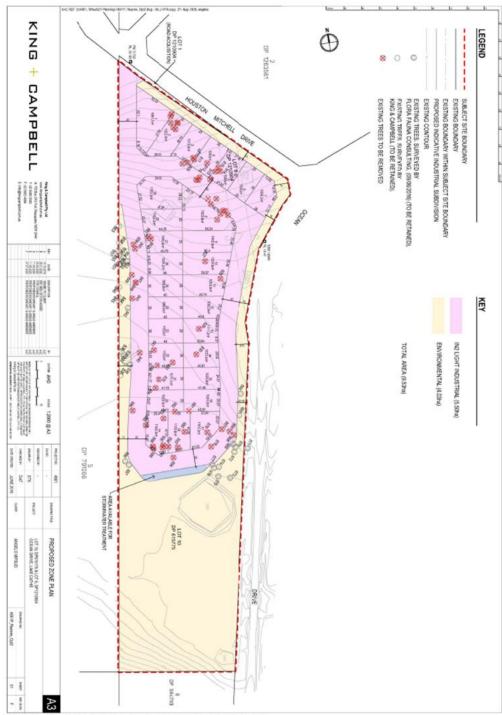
Proposed Zone Plan showing a concept subdivision layout
